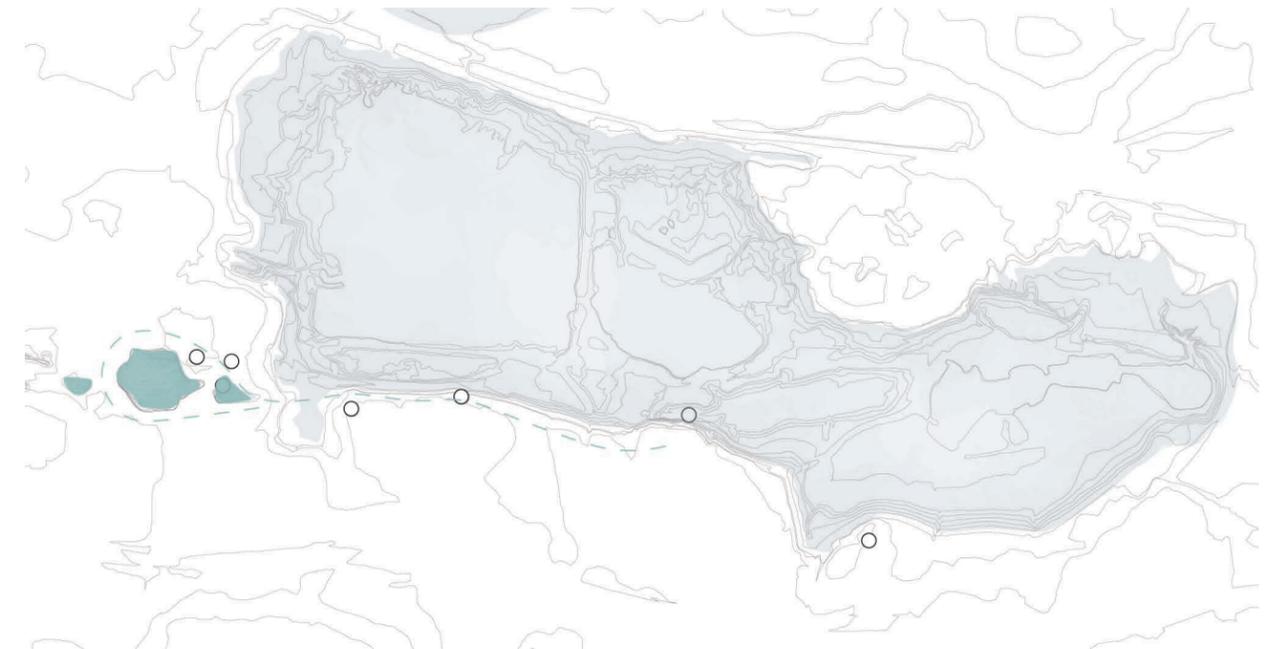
Thermal Hot Spring Vignette & Site Plan.
